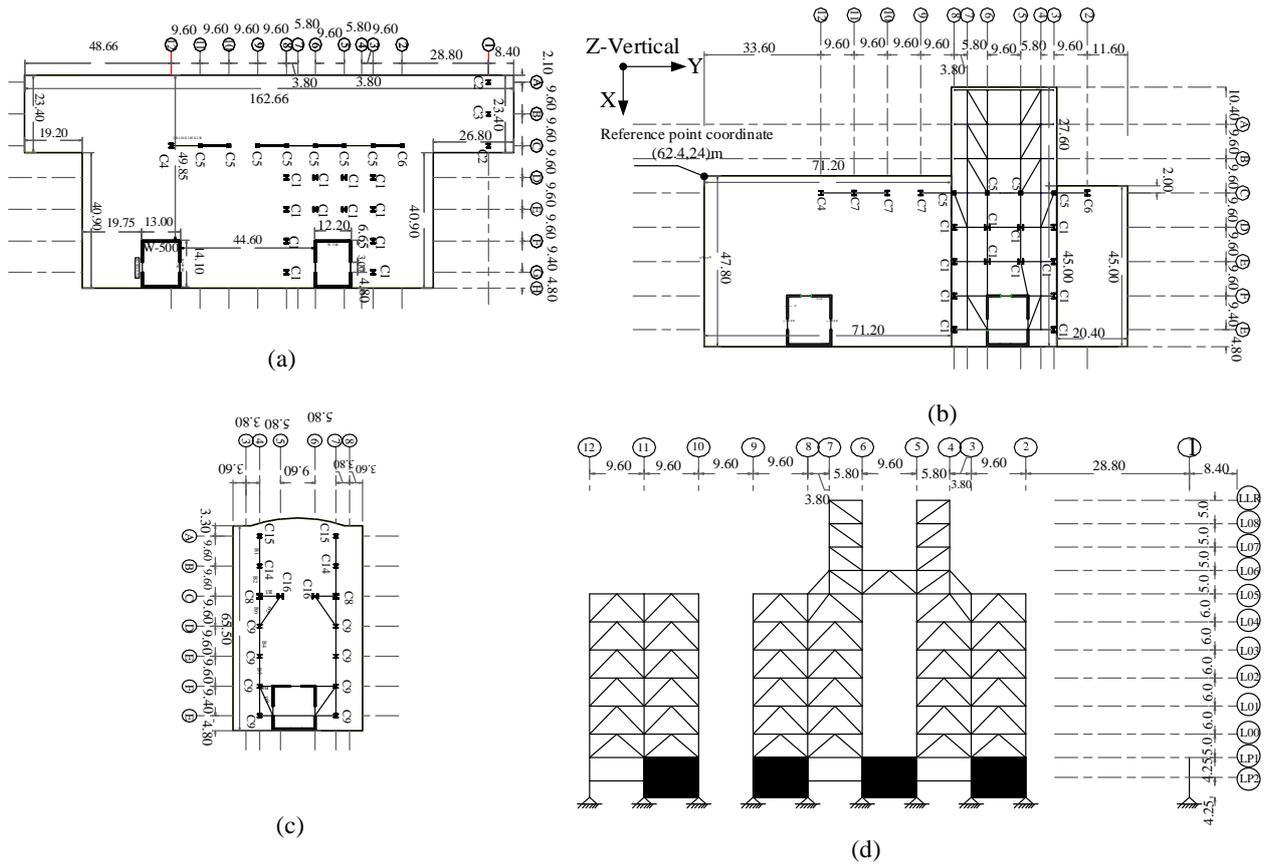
Typical planes and elevation of the selected building (a) ground floor (b) 5<sup>th</sup> floor (c) roof (d) steel braced frames along the grid C.
